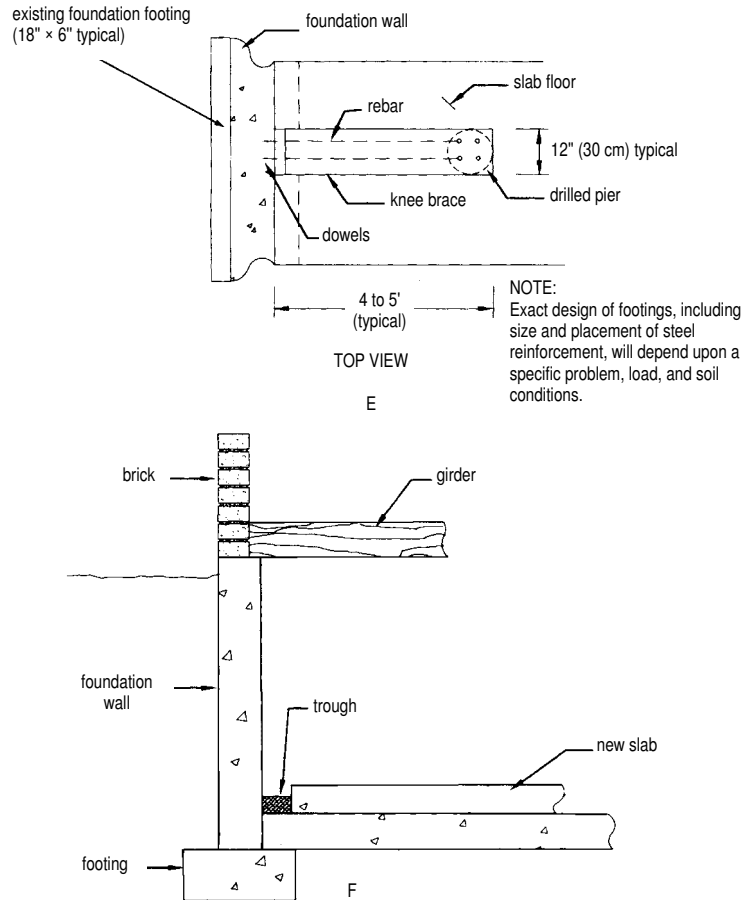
B.5.1. (continued). Basement/foundation wall repair. (e, f) Water control.
